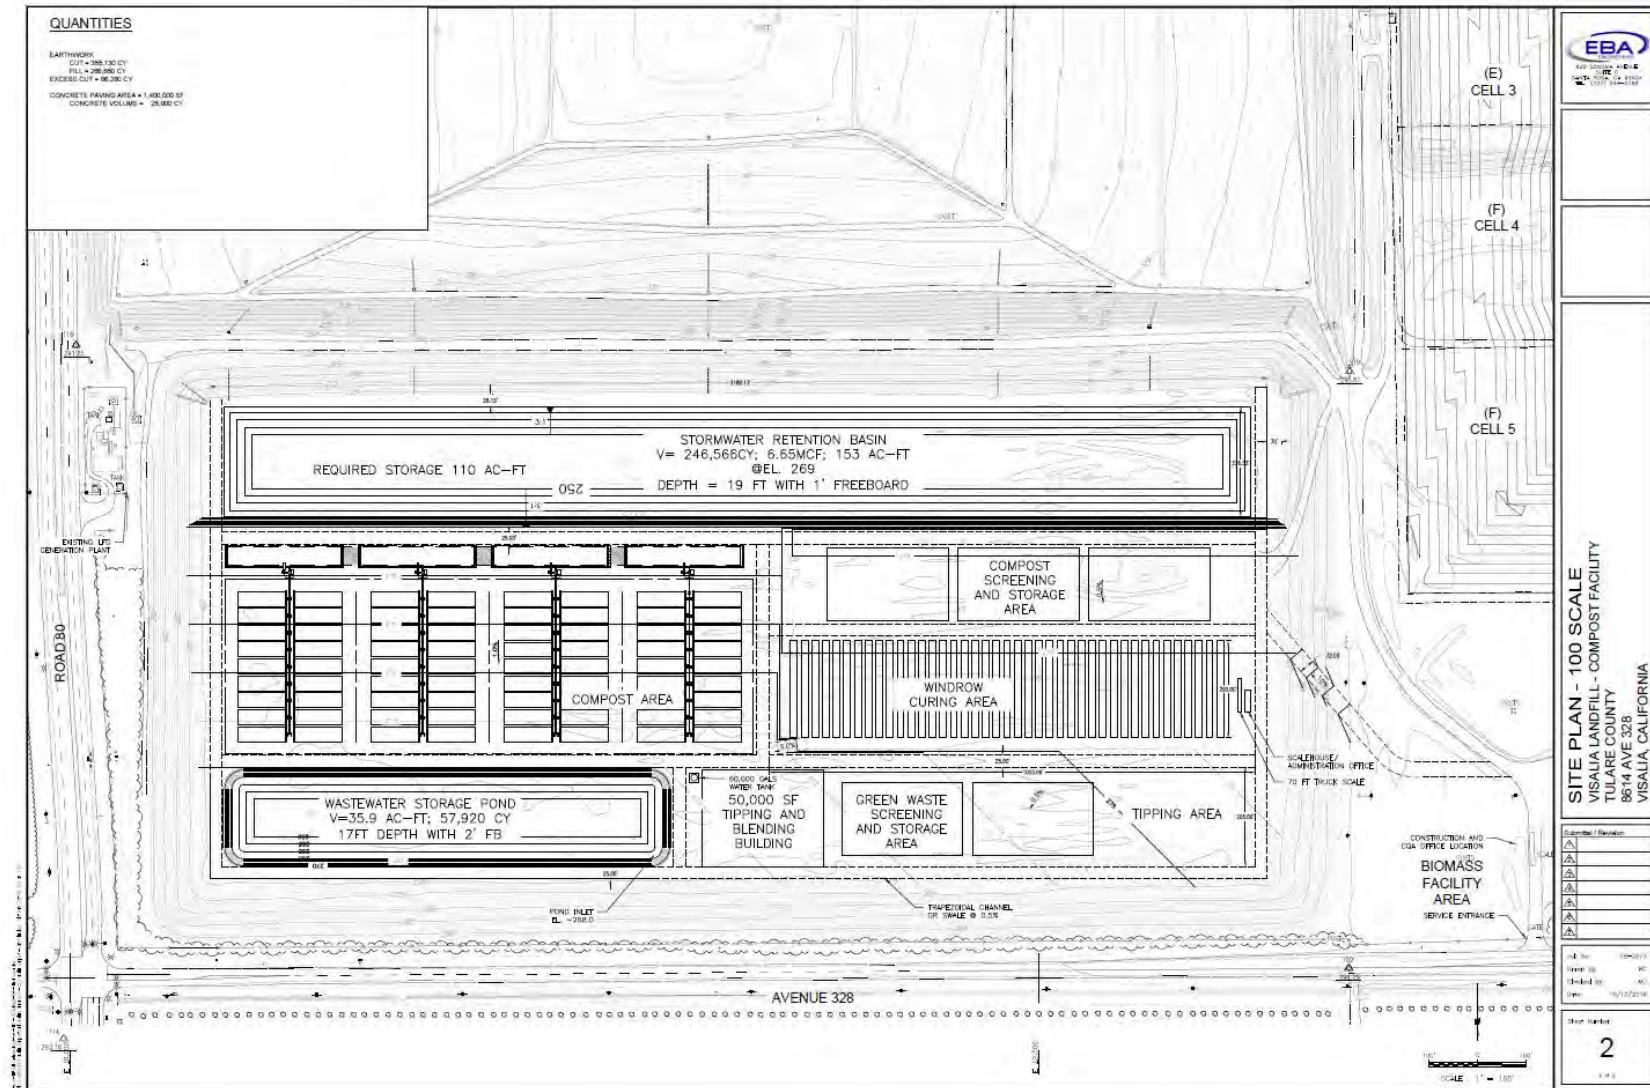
Visalia Landfill Site Plan Showing Composting and Biomass Facilities
